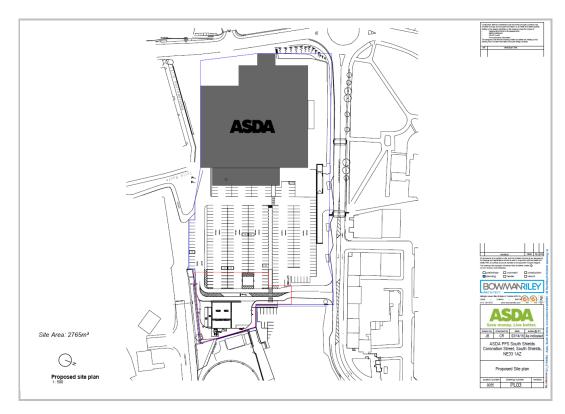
Proposed Site Layout (Bowman Riley Architects)
